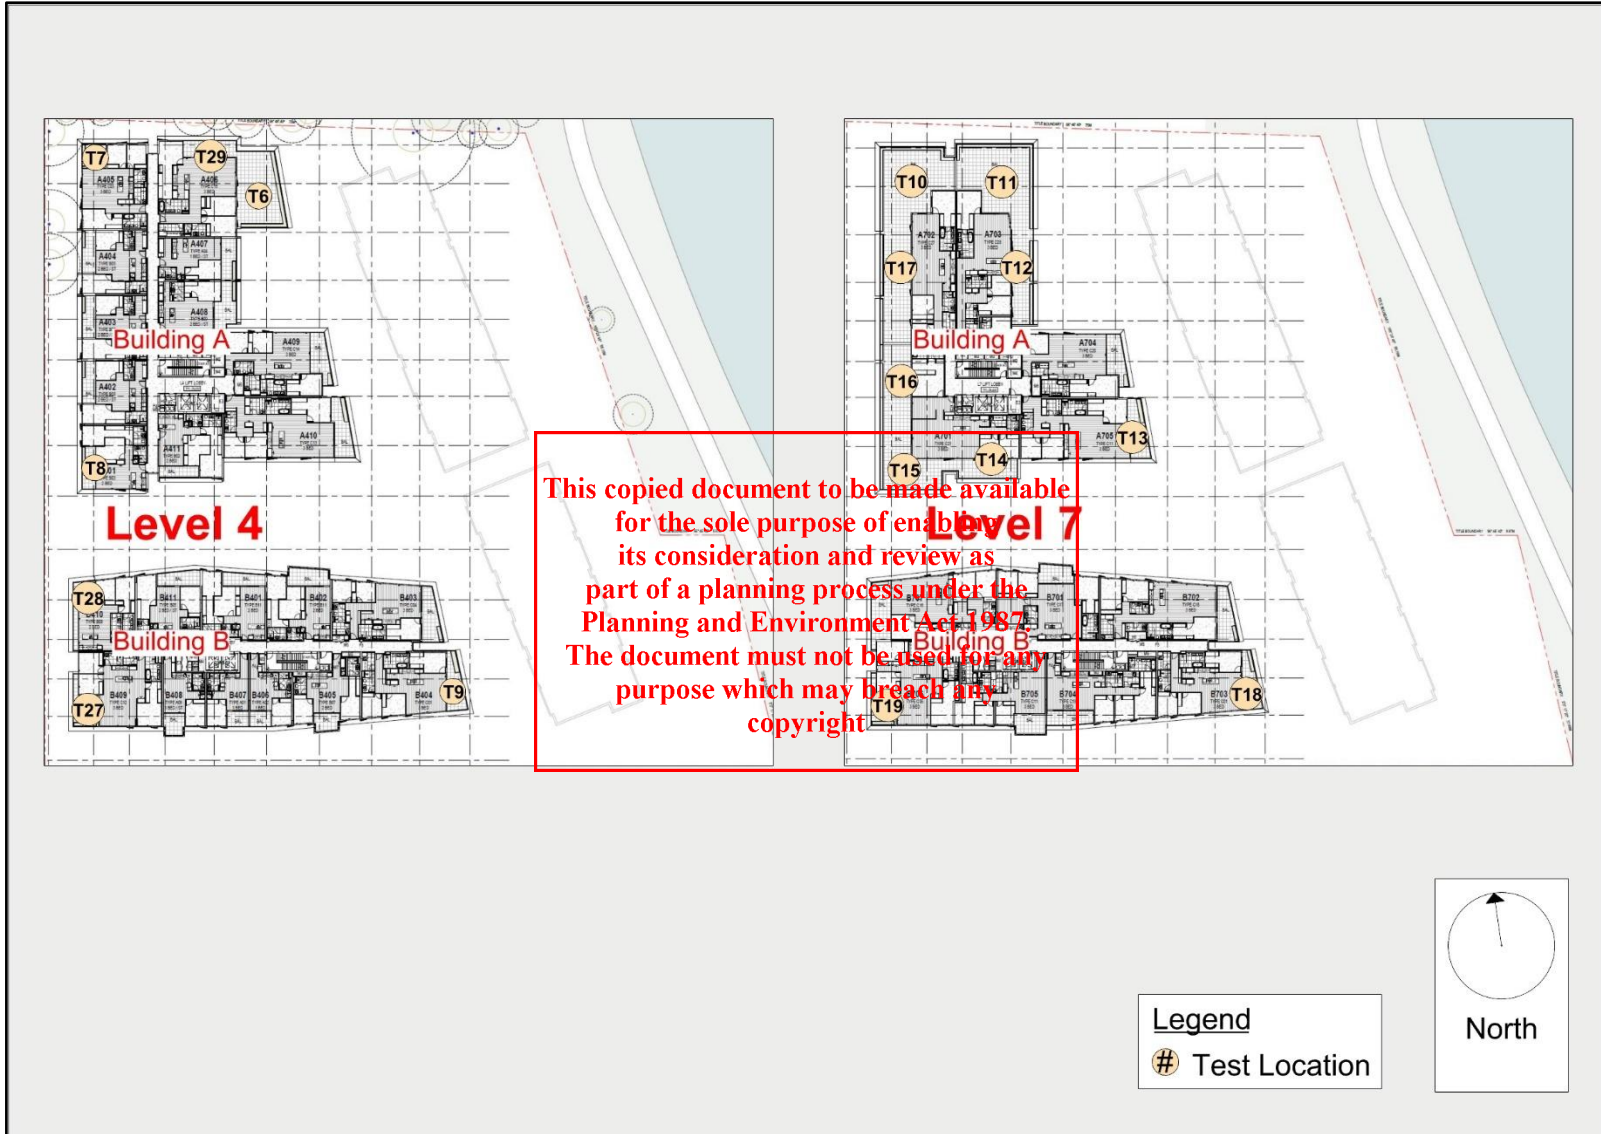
Level 4 and 7 Terraces Test Locations on the proposed 43 and 63-67 River Street development.
